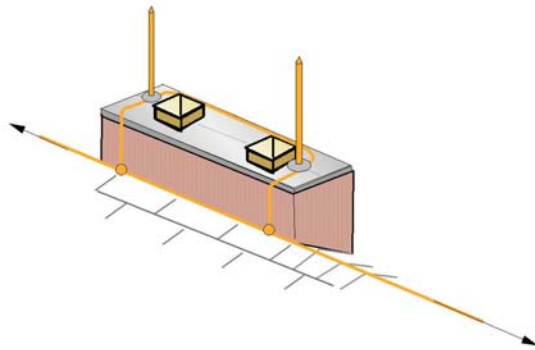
Redrawn excerpt from LPI-175 shows Air Terminals on a chimney connected to a conductor running along the ridge of a roof and at the ends of the roof the conductor will run down the structure and be connected to ground rods buried in the earth.
